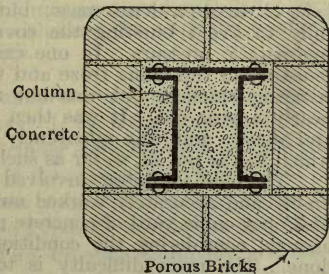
Brick Column Casings, U.S. Government Printing Office, Washington, D. C.
